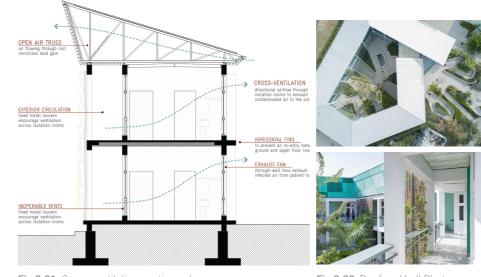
Cross ventilation section scheme Source: https://massdesigngroup.org
